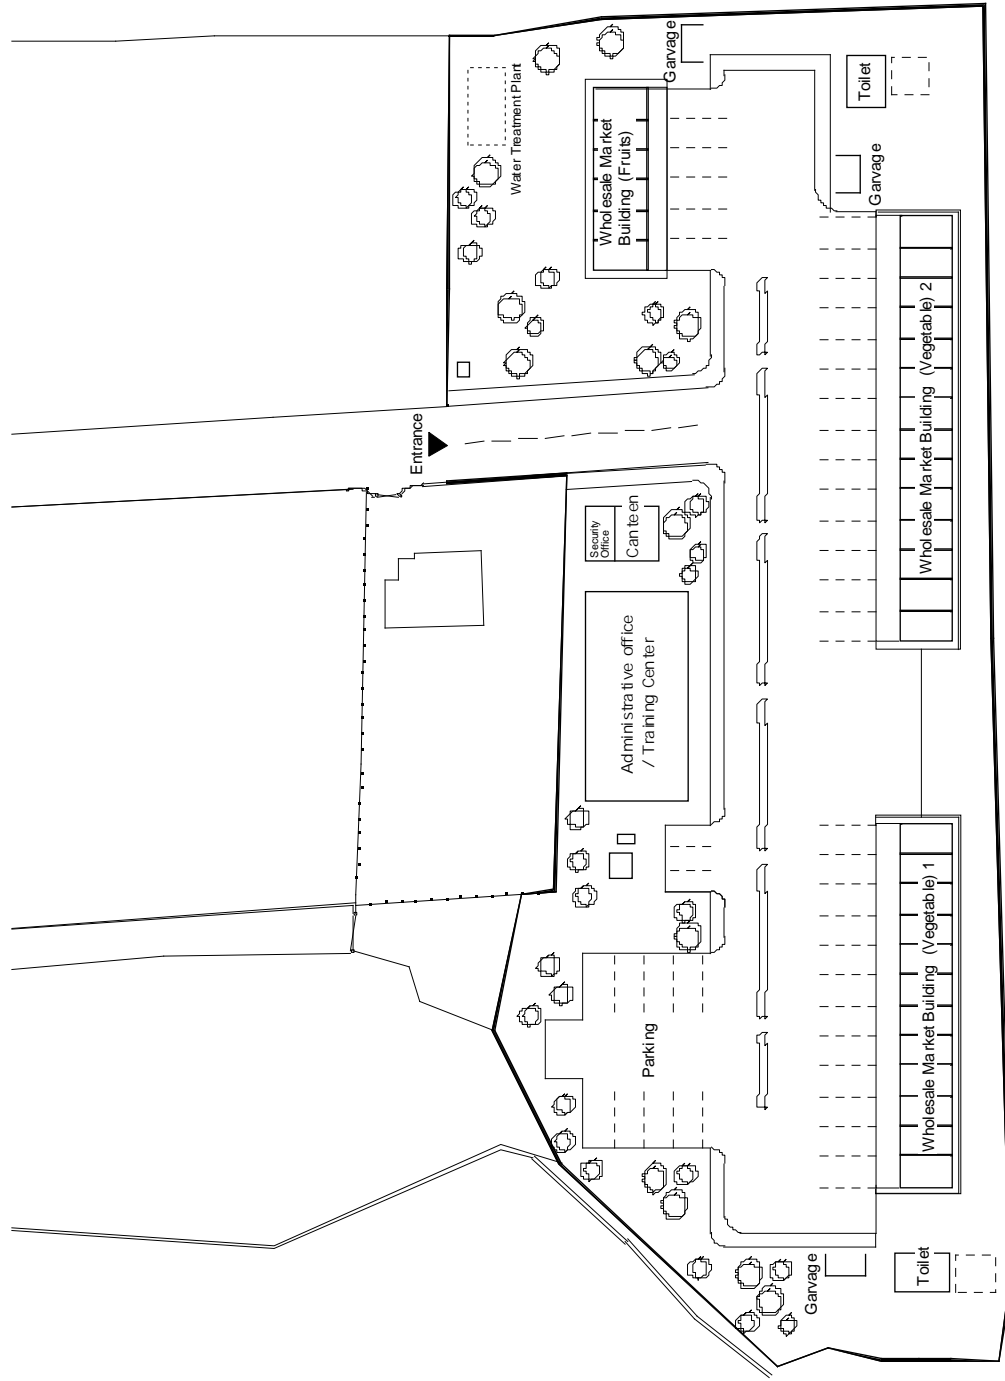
Layout Plan of New Wholesale Market in Site 2, Biratnagar Scale 1 : 1000
